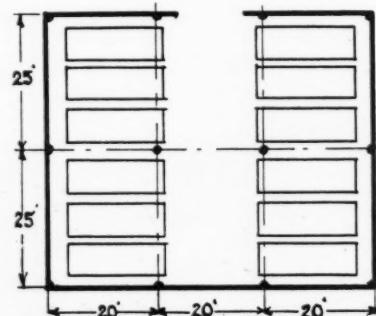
Showing the advantage of the center aisle principle which makes room for twelve cars with the same floor space as used in Fig. 1
